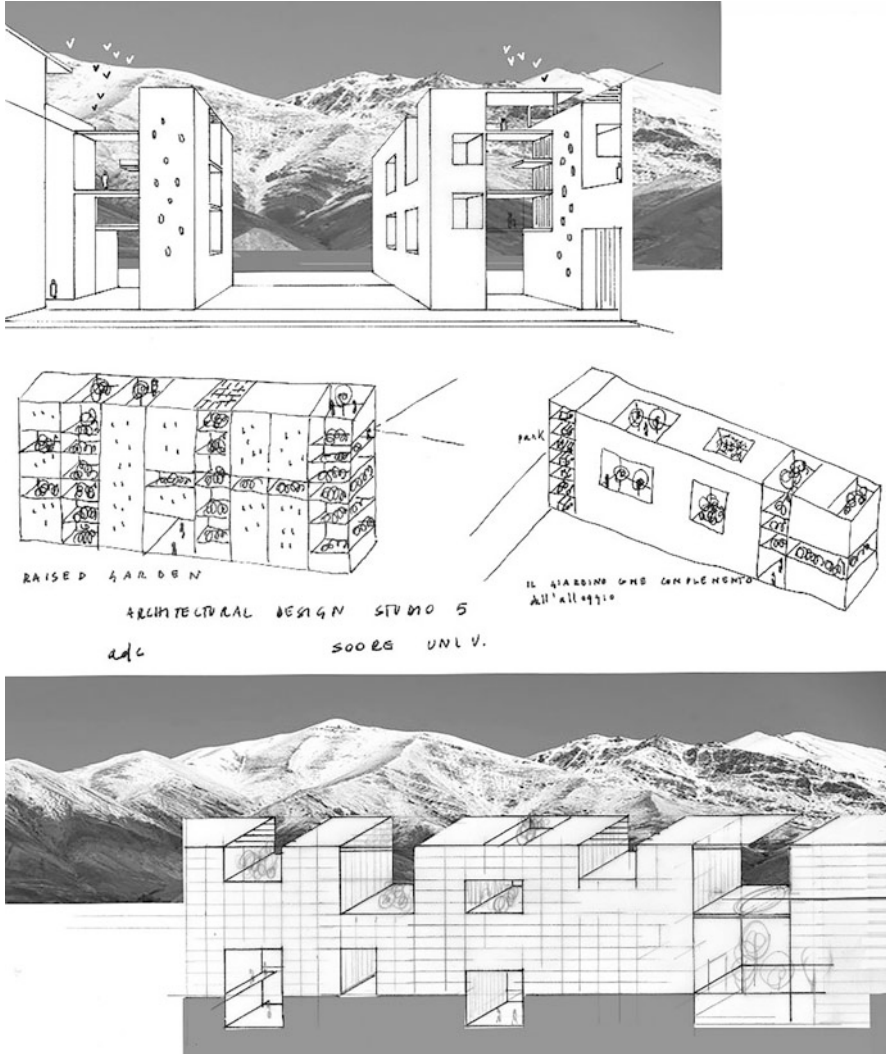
Tehran, raised garden buildings. (Source: Author's elaboration)
